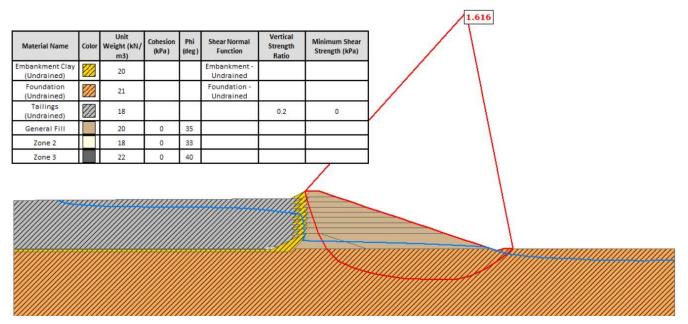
Slip Surface in Perimeter Embankment Downstream Batter Slope, Short-term Undrained Loading Condition
